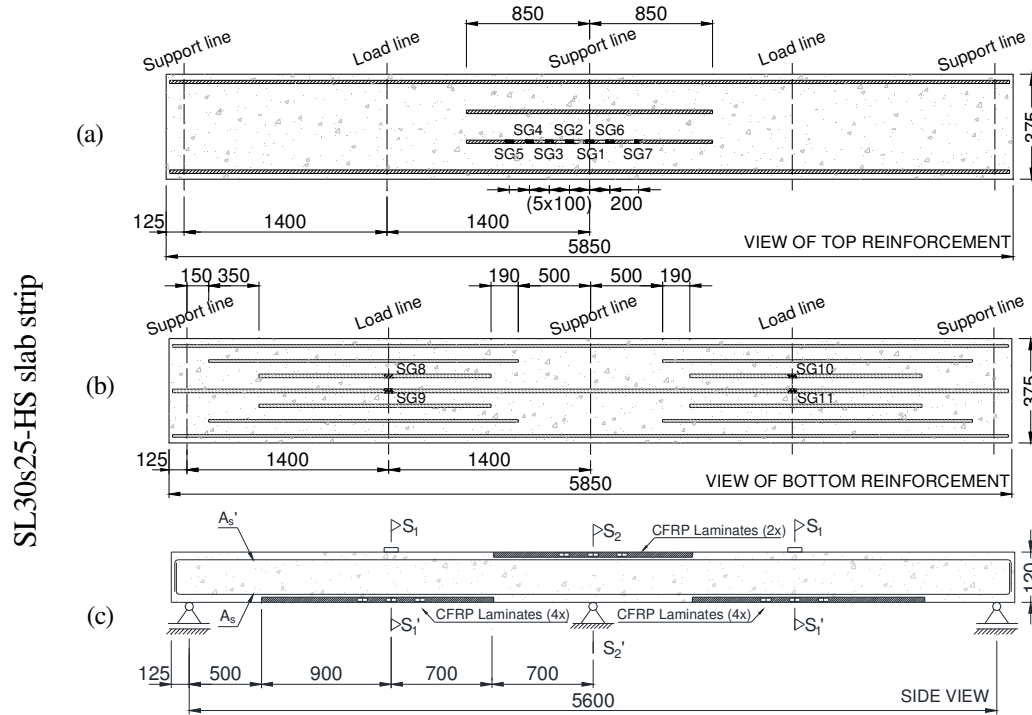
Arrangement of the (a-b) longitudinal steel reinforcement and (c) CFRP laminates of the SL30s25-HS slab strip.
